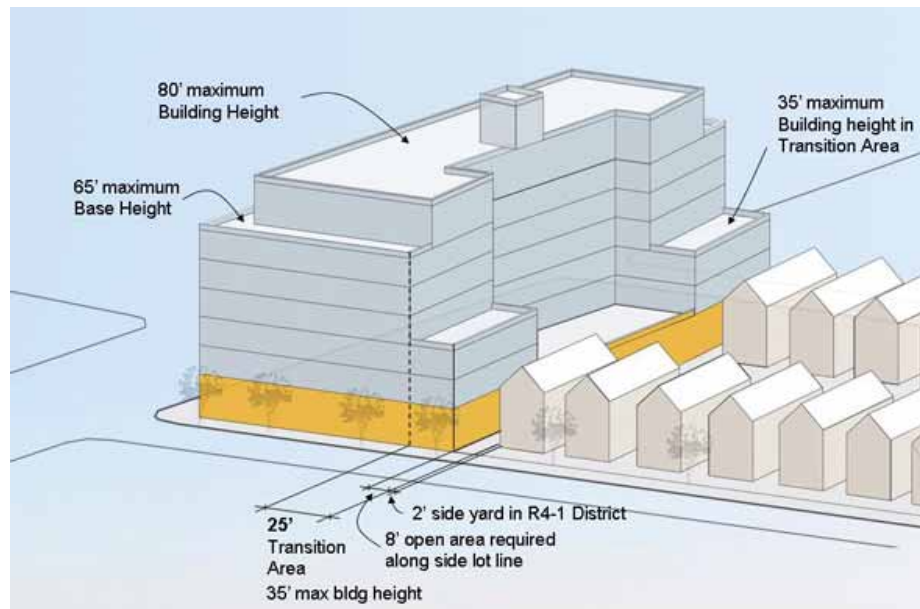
Diagram illustrating height and setback requirement for new construction in zoning district R7A (Source: New York City Planning Commission, Department of City Planning, 2010)
